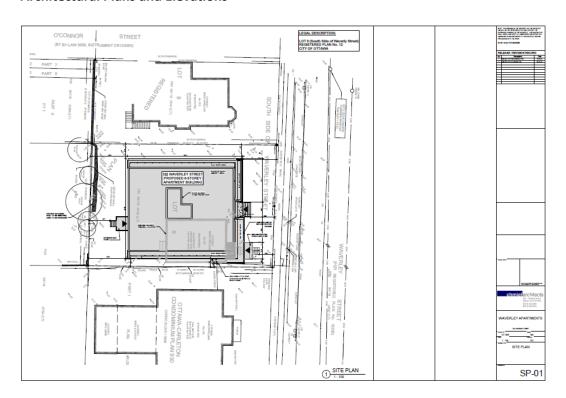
Site plan of the proposed development illustrating its relationship to adjacent heritage buildings. The portion of the front façade and sidewall are incorporated into the new build. Source: Chmiel Architects 2020.
